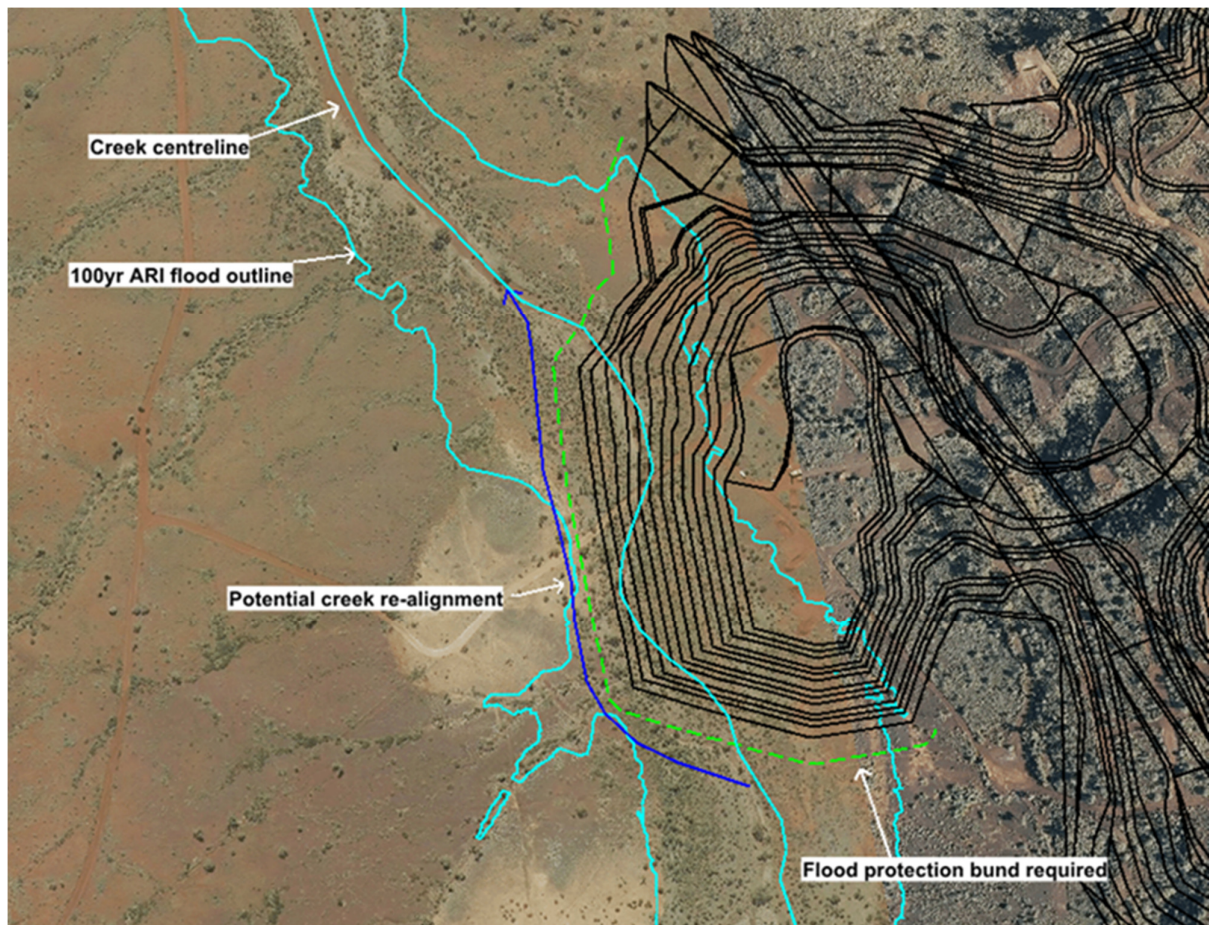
The proposed final pit shell of Pit 1 intersecting the Purlykuti Creek
